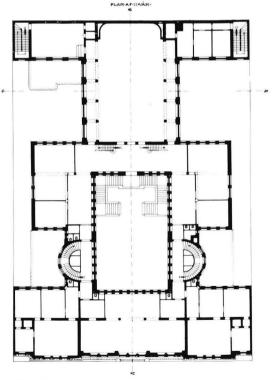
Plan of the second floor, main drawings, 1910. (HKRVVA).
